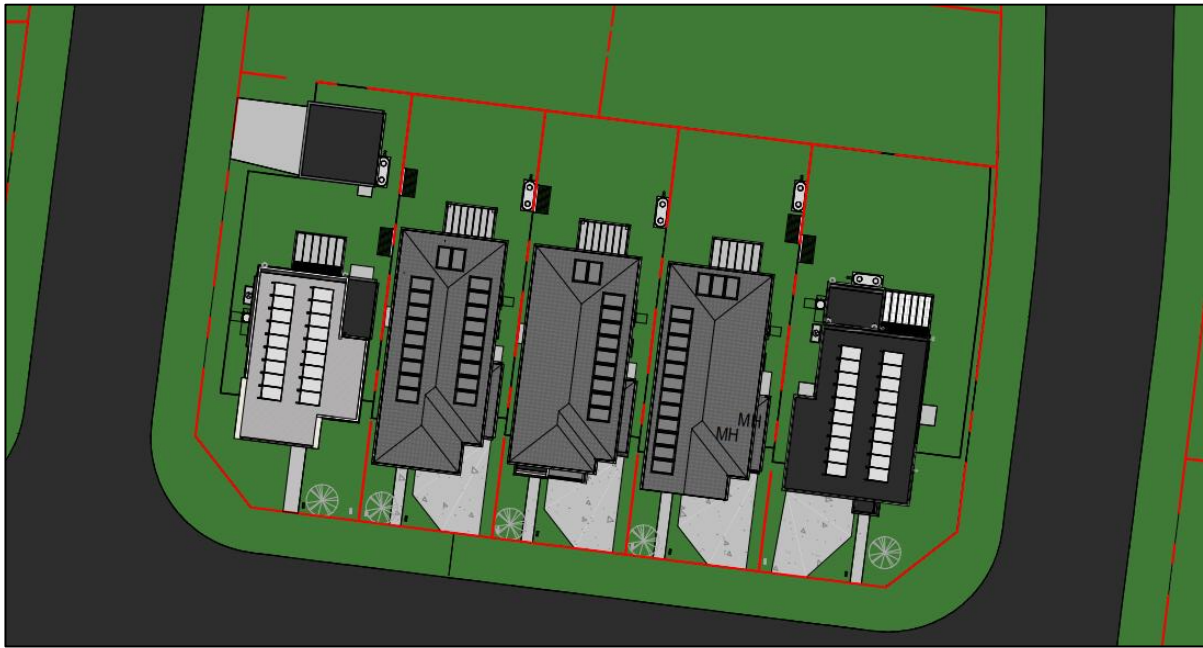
SITE PLAN (PROPOSED LOTS 3-09, 3-071, 3-072, 3-081, 3-082)
